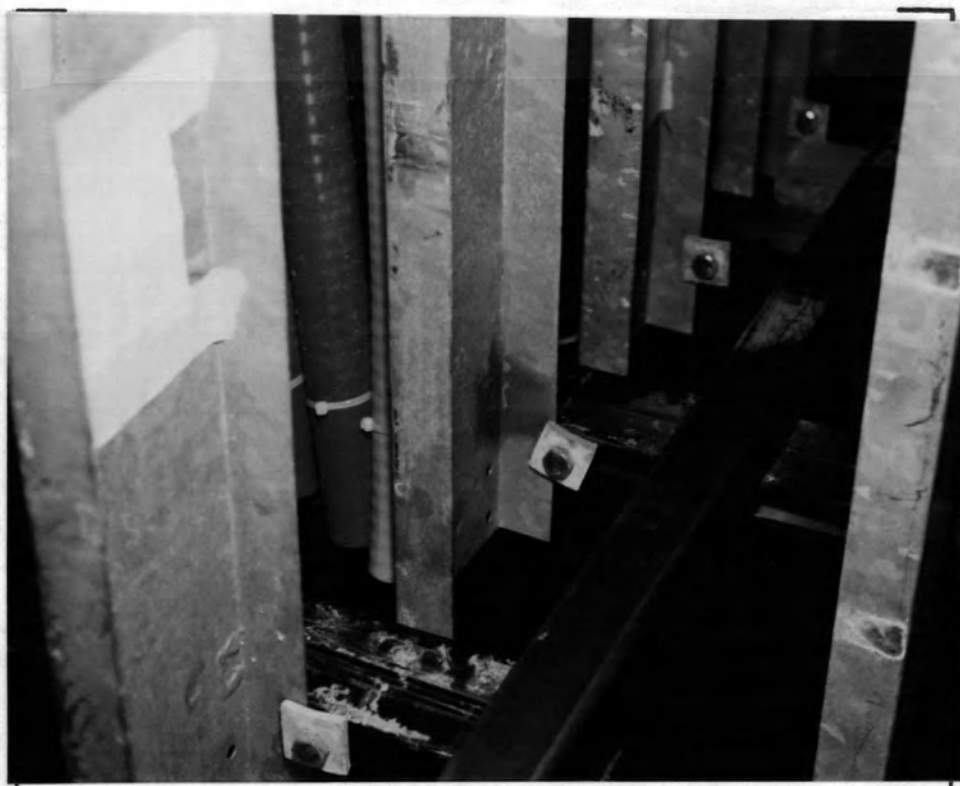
PLACEMENT OF CABLE AND CABLE TRAY
